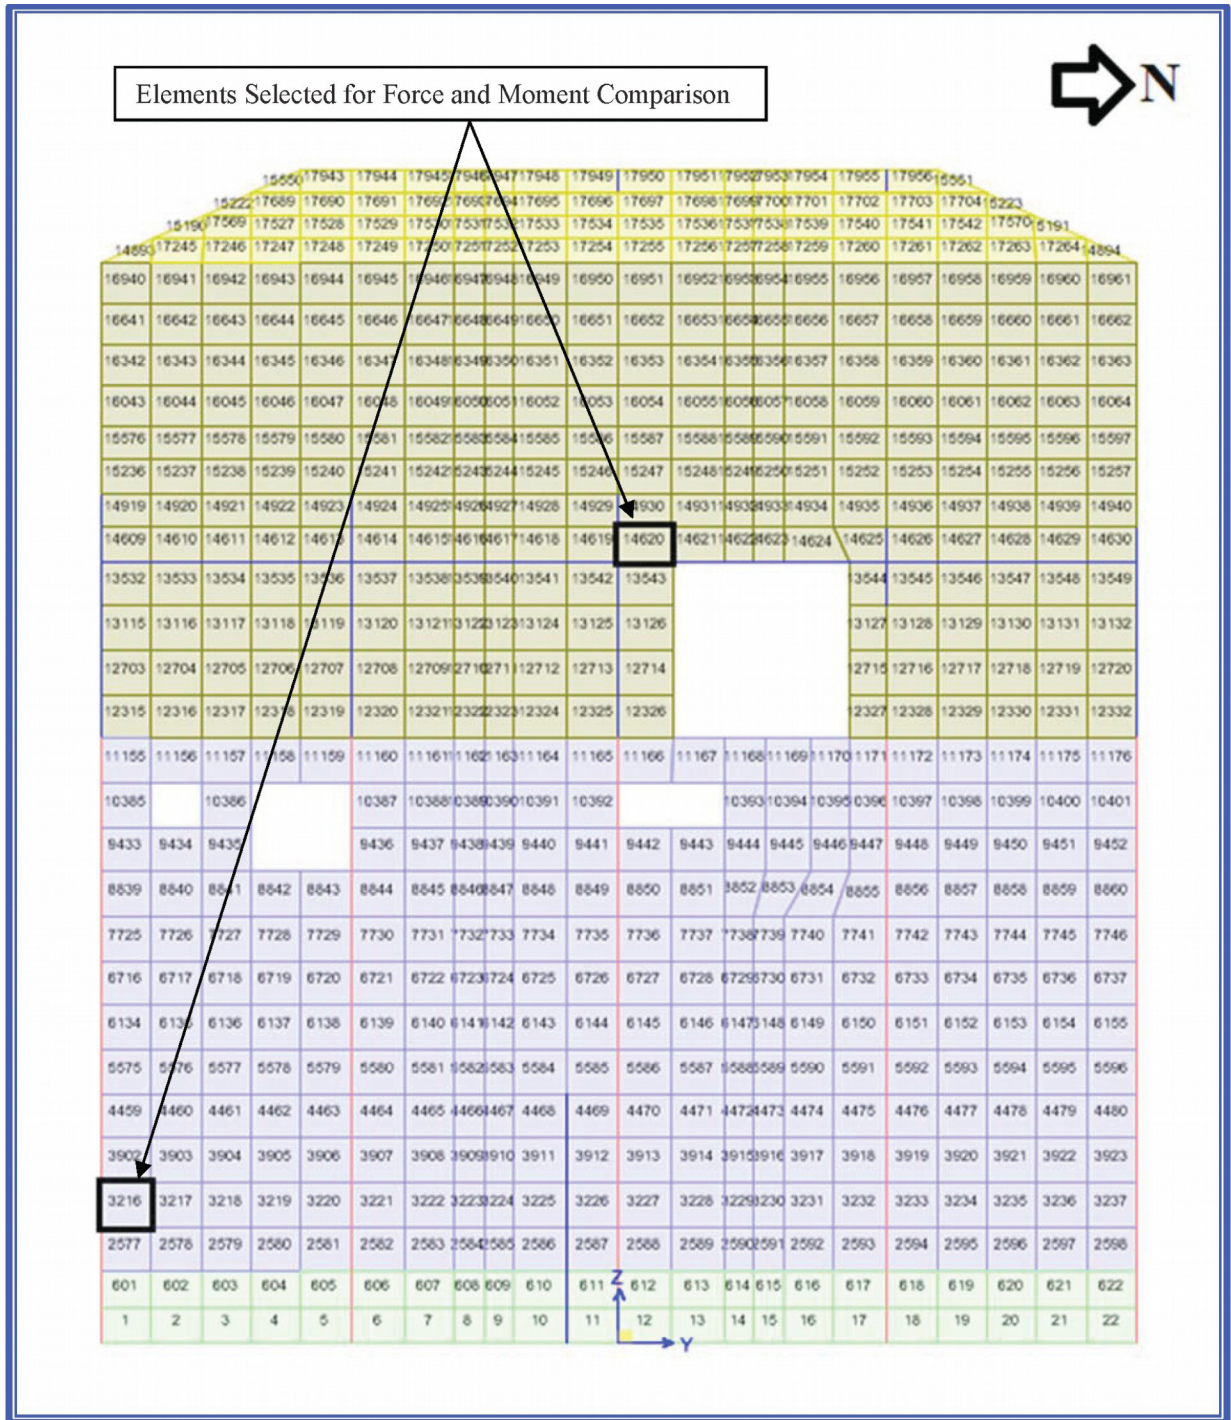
Elevation View of West Wall of RXB Looking West, Showing Location of Shell Elements 3216 and 14620.
